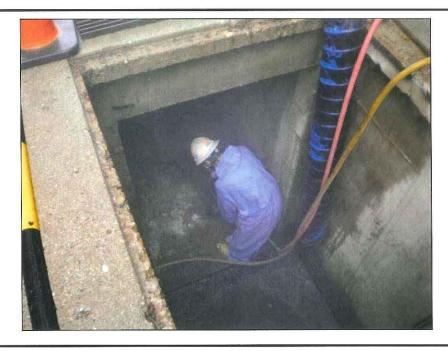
Jack-hammering of concrete floor into small pieces for removal from electrical vault. Also shows air duct hosing used for dust control.
